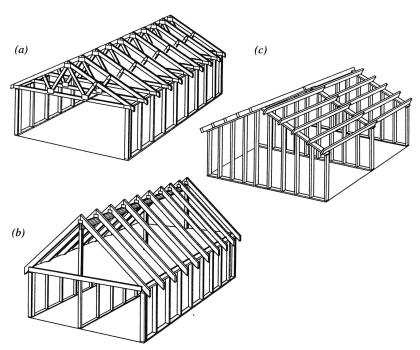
Roof constructions (NBI Handbook 38 Timber Frame Houses). (a) Trussed rafters, (b) rafter roof, (c) purlin roof.
